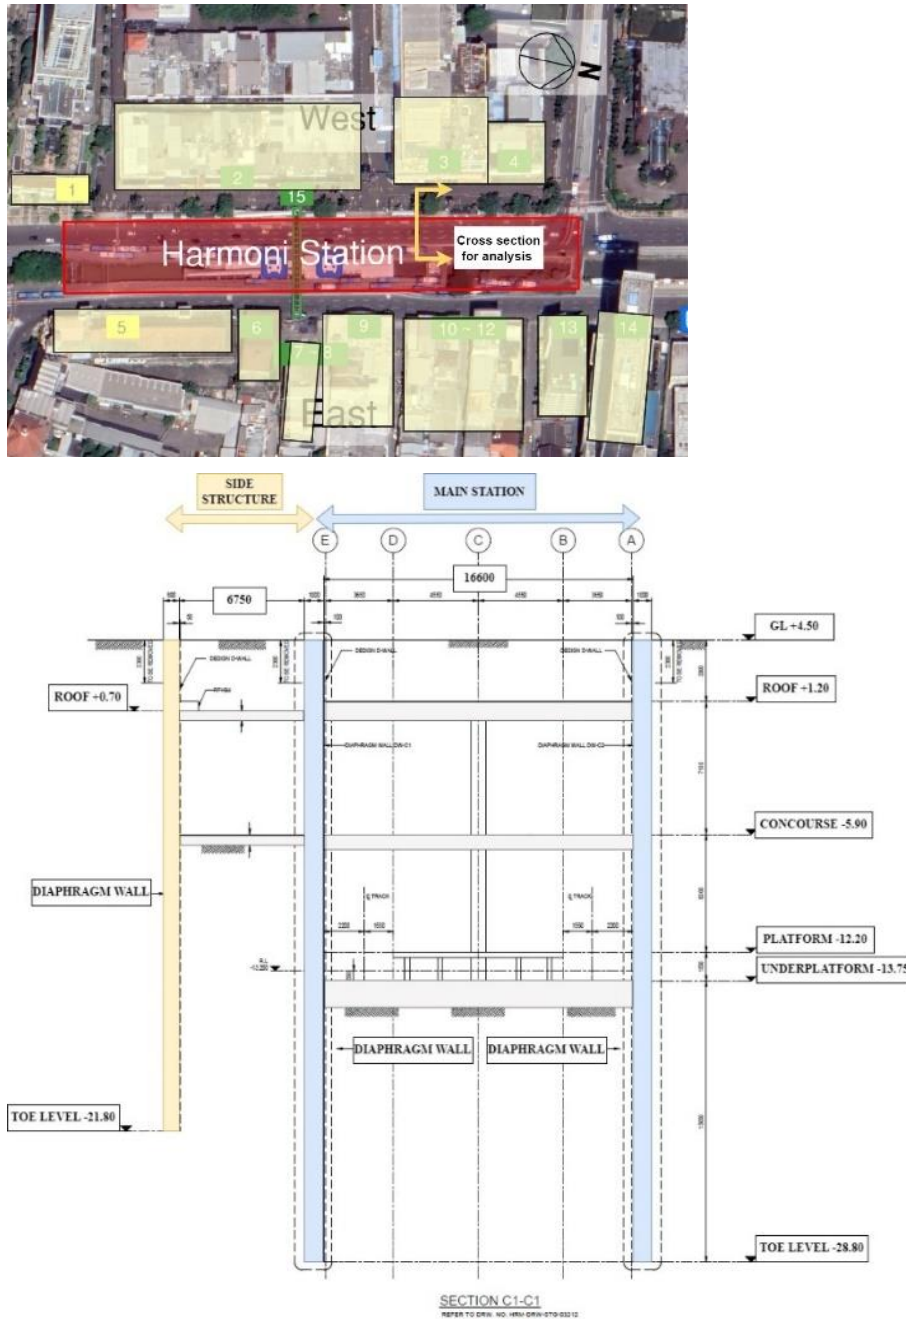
Plan view and cross-section of Harmoni Station permanent structures
